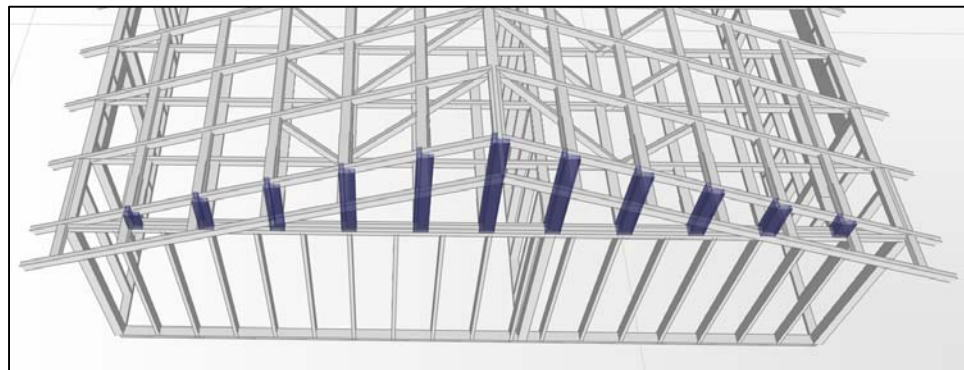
Gable-End Studs + Retrofit Studs Modeled with L-Shaped Cross-Section
